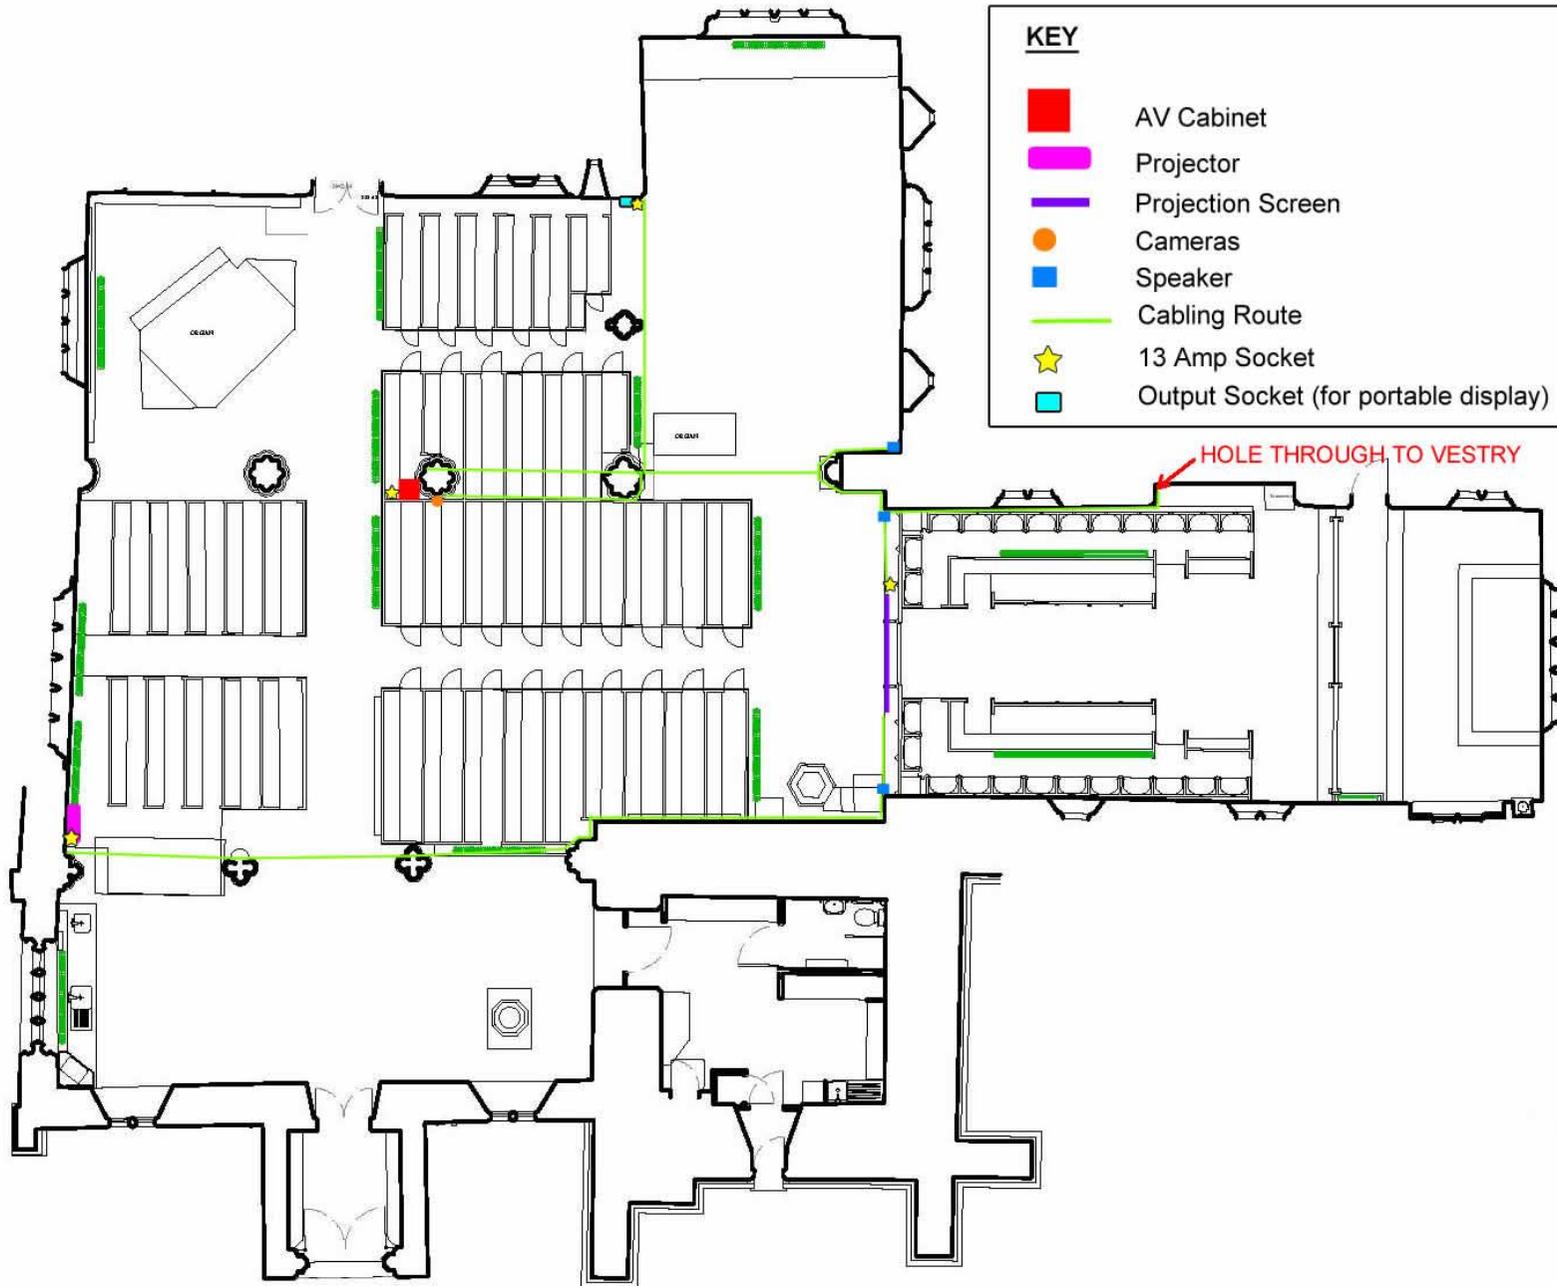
Plan illustrating equipment locations and cable routes (plan © John Falconer Architects)
